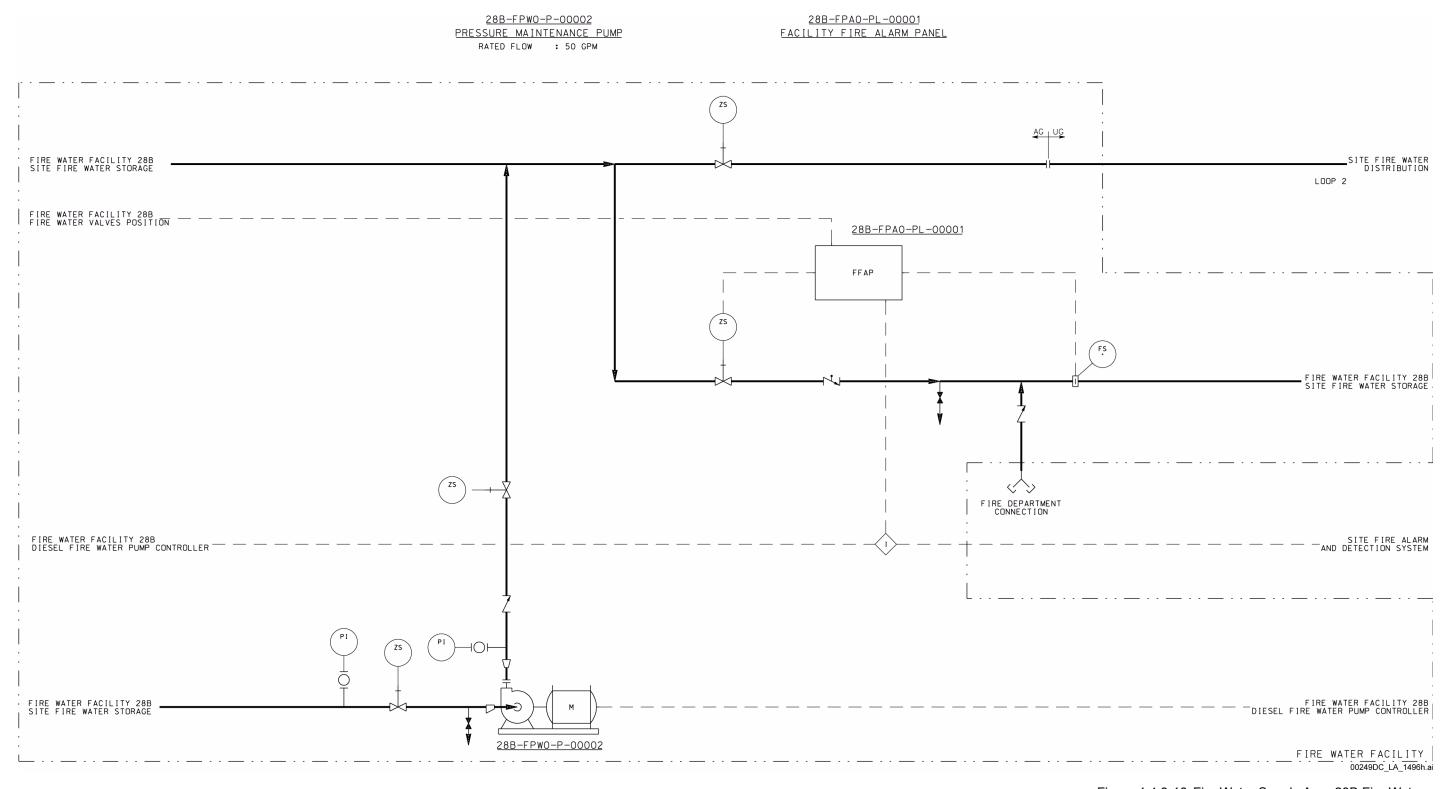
Fire Water Supply Area 28B Fire Water NOTE: AG = aboveground; FFAP = facility fire alarm panel; UG = underground.
